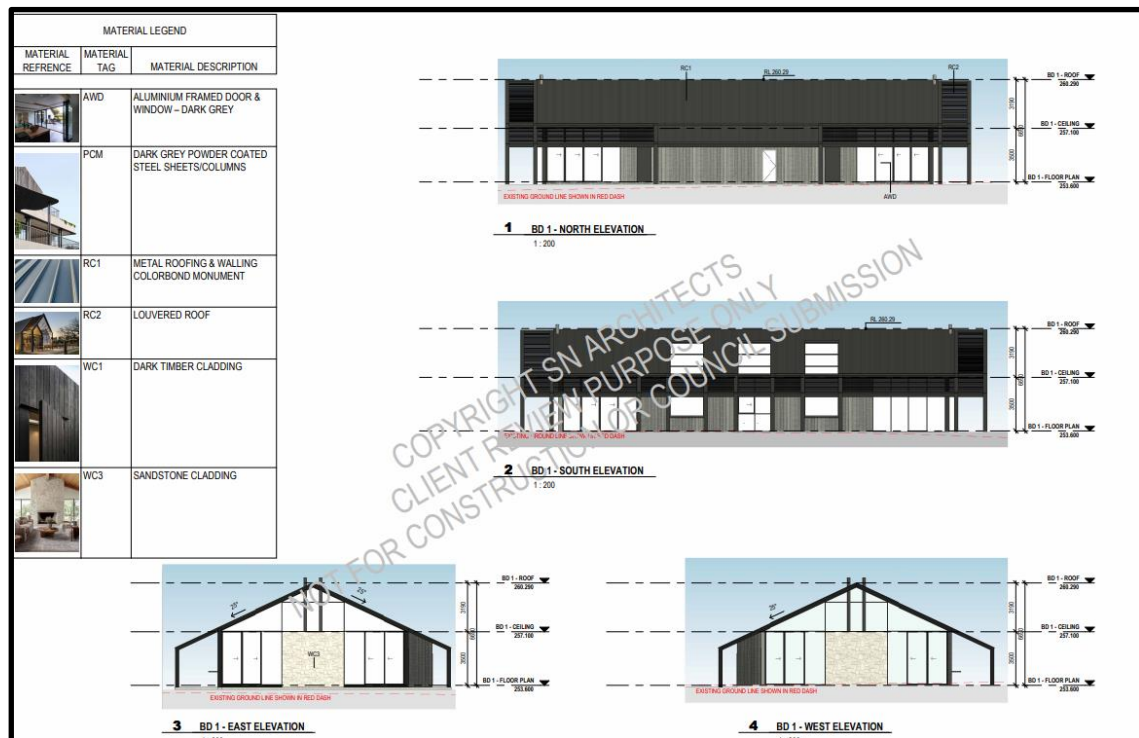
Bakery Elevation Plan (Source: SN Architects)
